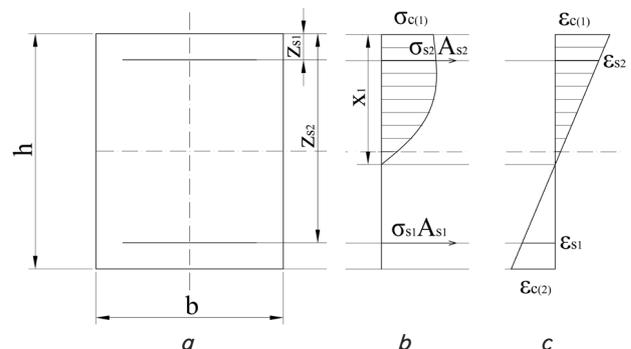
The estimated cross-section of the bending element of a rectangular cross-section: a – cross-section of the element; b – stress diagram; c – strain diagram
